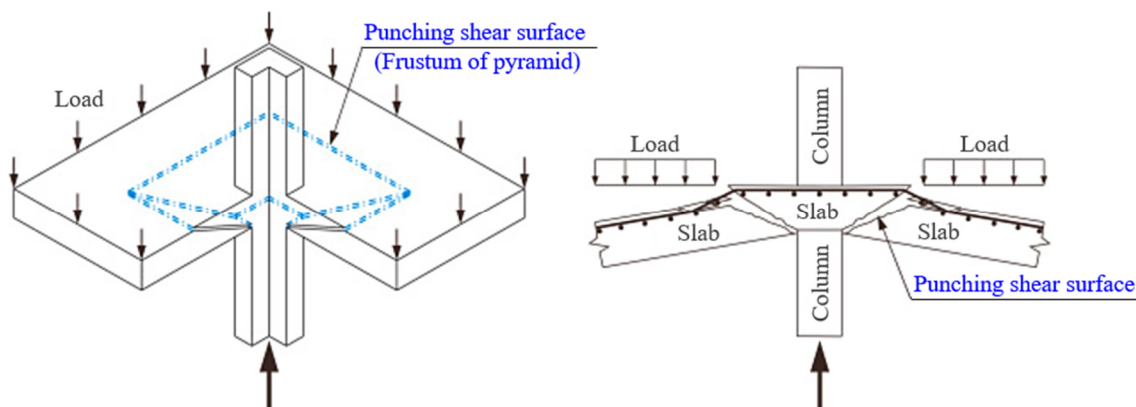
Slab-column connections and punching shear failure in slabs [15]
